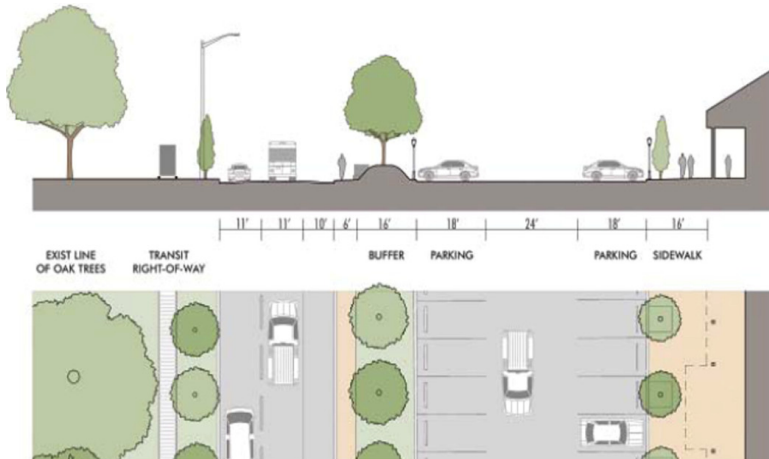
Street Plan and Section of St. Claude Avenue (Provided by H3 Studios)
